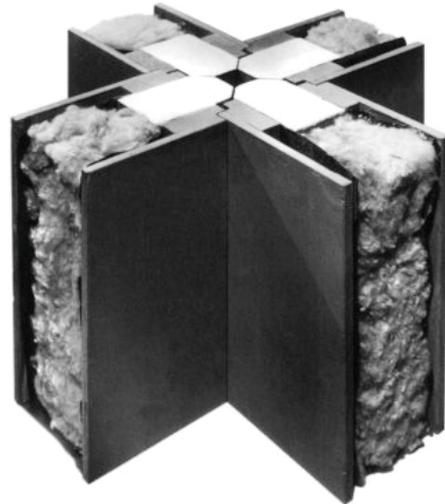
The Packaged House System. Panel wedge connections mock-up
